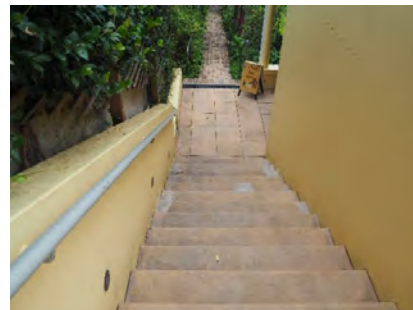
115: Stairs connecting view platform and street entry to tea room terrace
